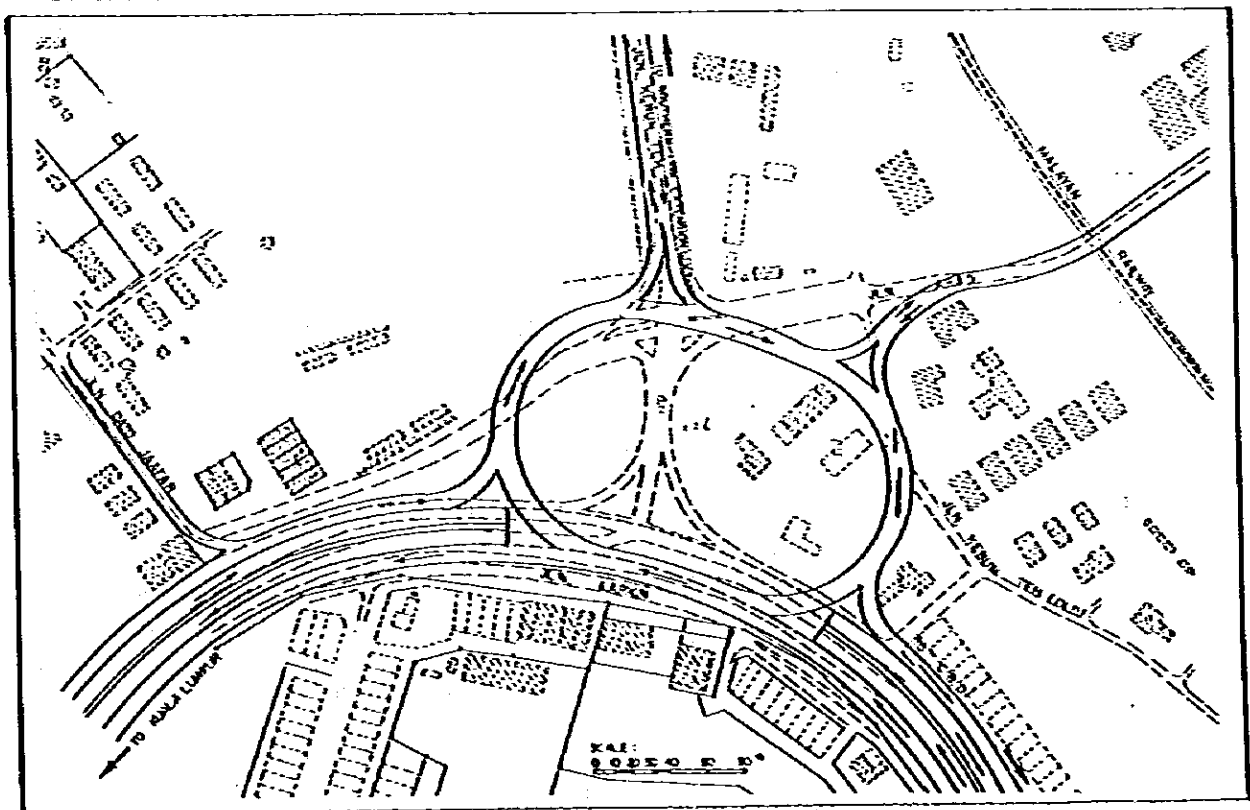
INTERSECTION IMPROVEMENT PLAN AT THE INTERSECTIONS OF JLN KEBUN TEH WITH JLN LARKIN AND JLN ABAD (PLAN 'B')
